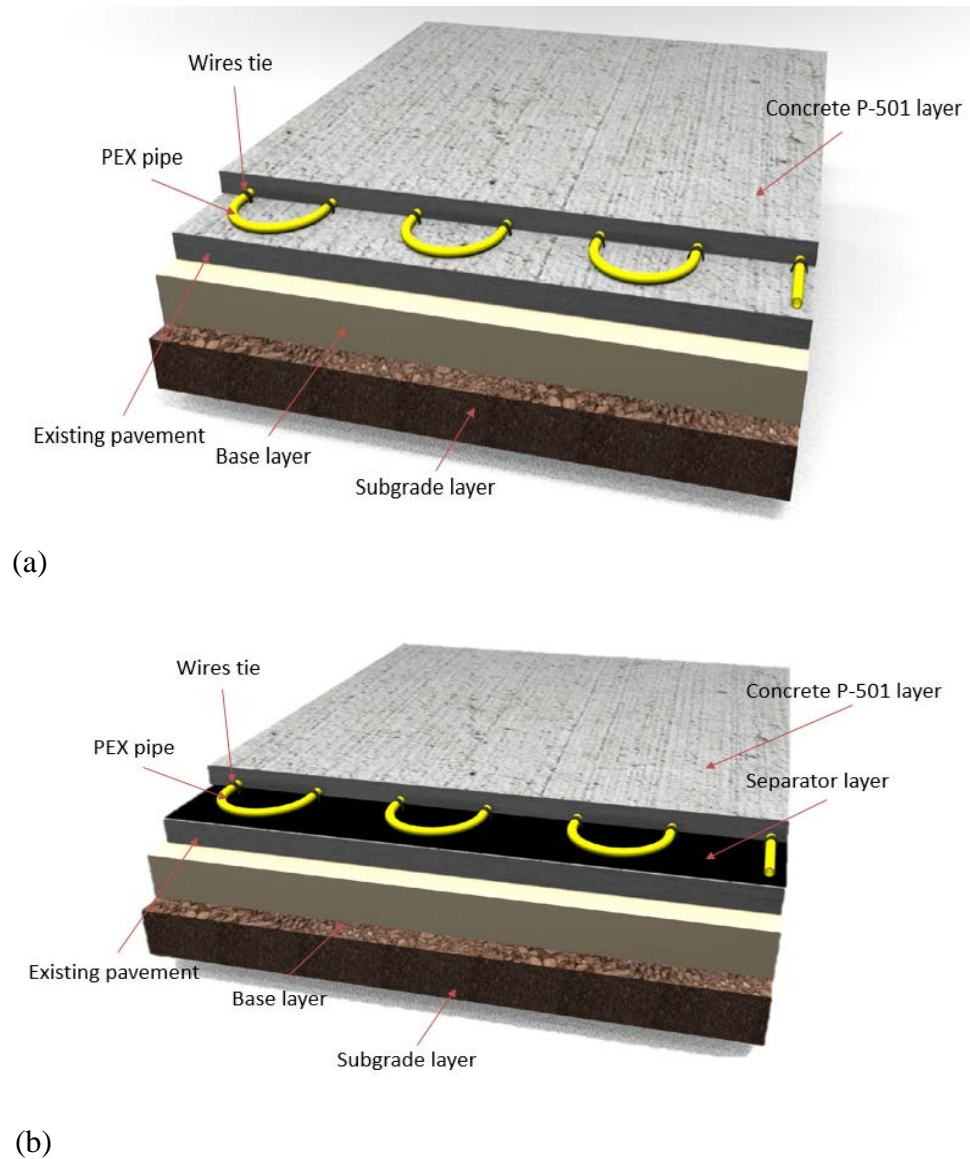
HHPS cross section (a) using bonded concrete overlay, (b) using unbonded concrete overlay
